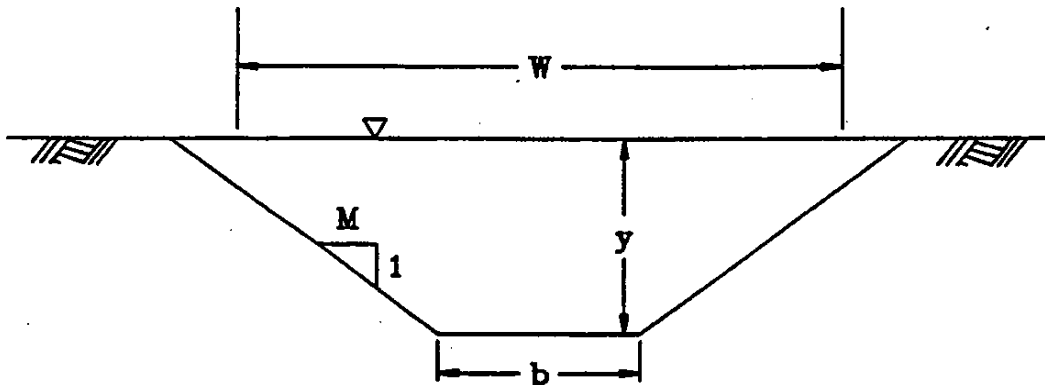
Trapezoidal Channel - Definition of Variables
